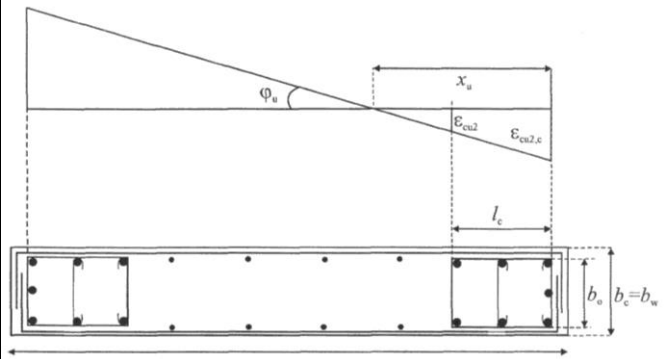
Confined boundary element of free-end wall end (top: strains at ultimate curvature; bottom: wall cross-section)
